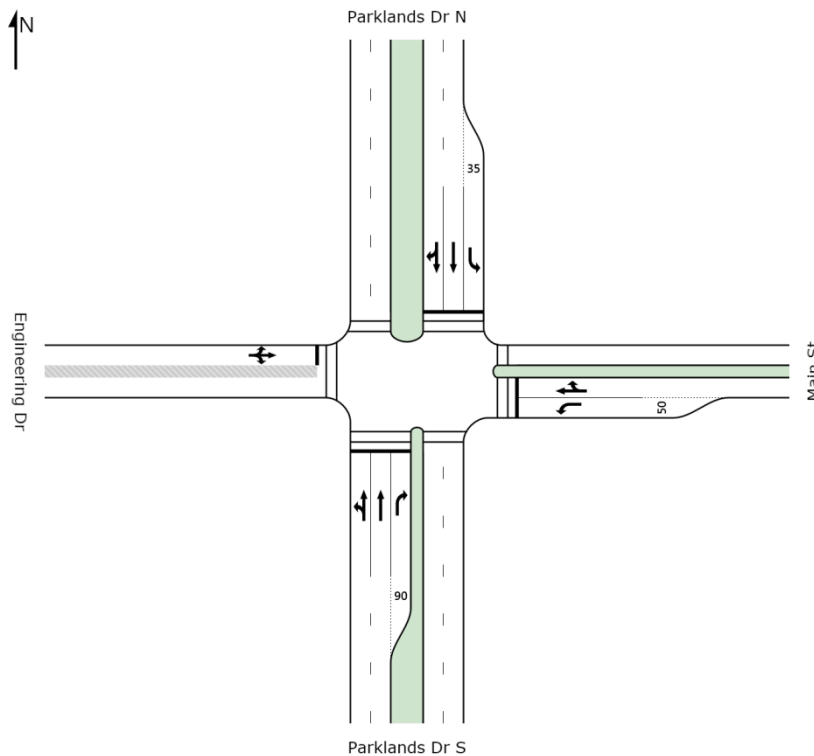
Parklands Drive / Main Street / Engineering Drive – SIDRA Intersection Layout
